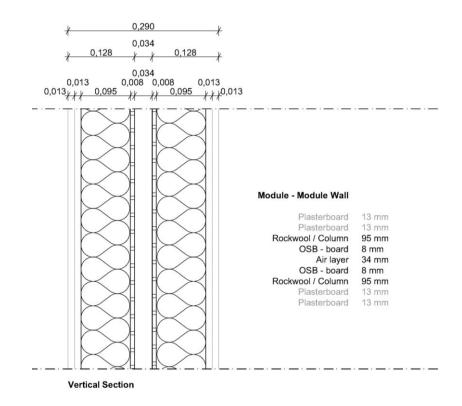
Vertical section of interior module wall (based on illustration by ARTEC)
